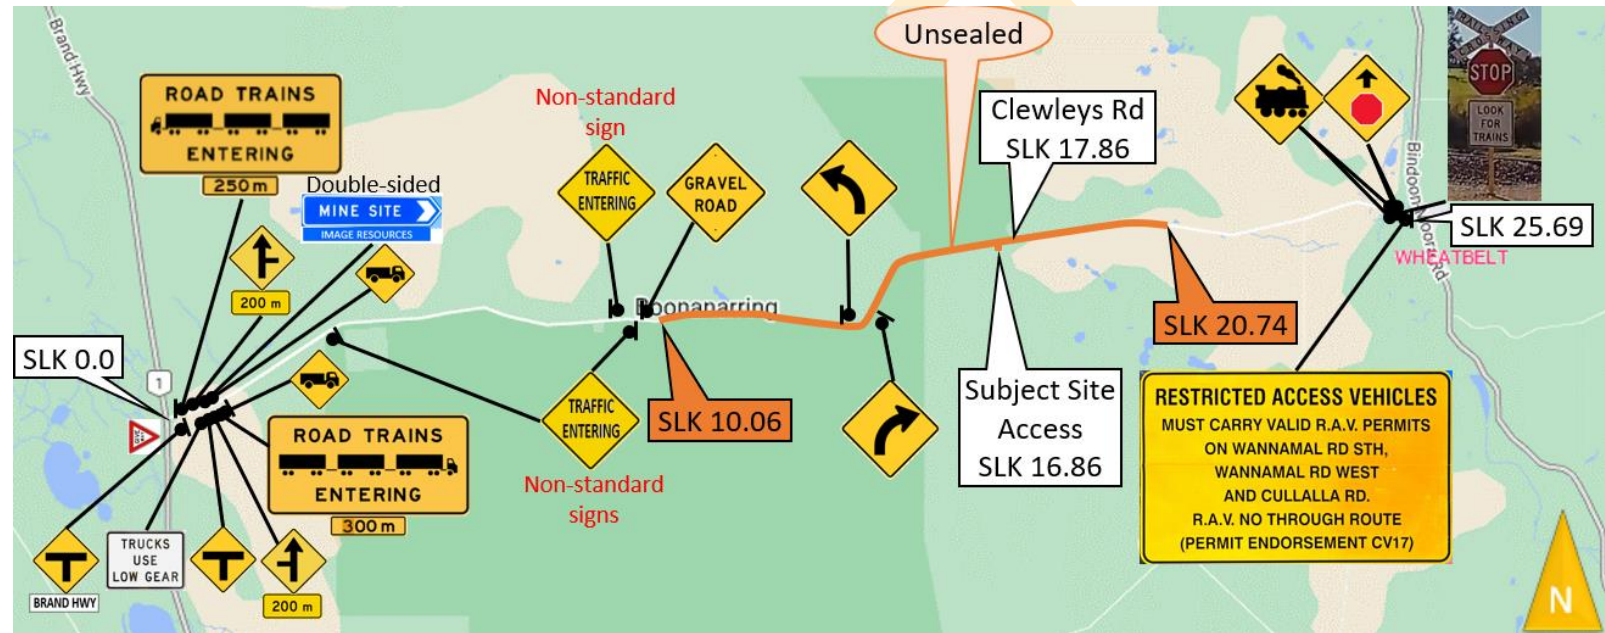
Extent of unsealed road and existing traffic management signs on Wannamal Road West
